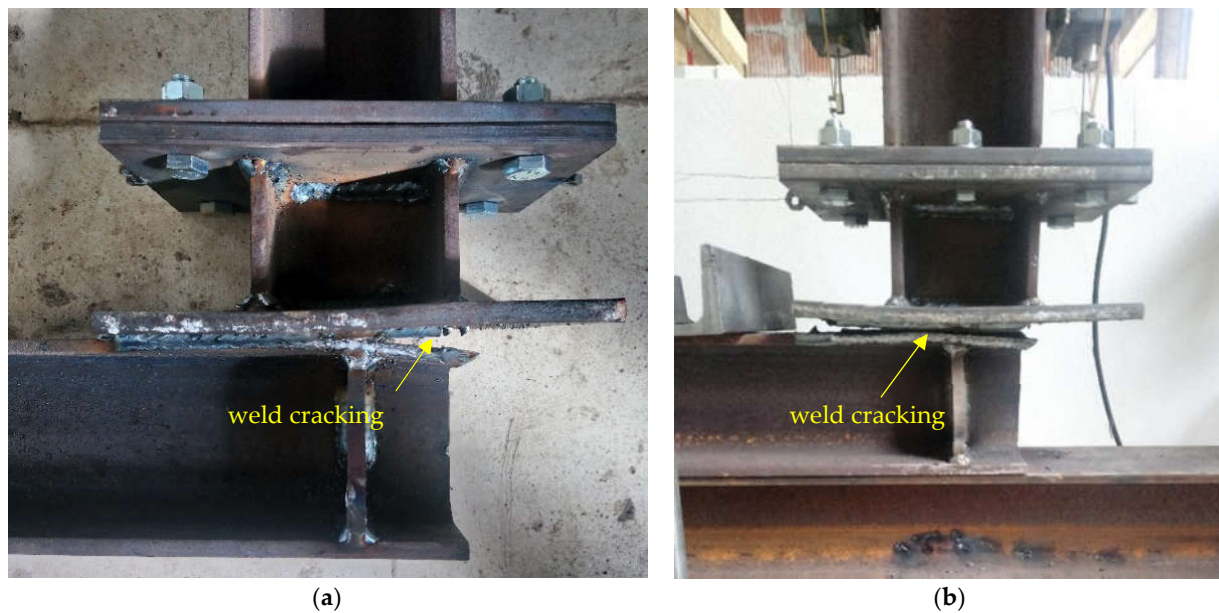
Failure mechanism of the steel bolted joint specimens: (a) JL-4 specimen and (b) JL-6 specimen.
